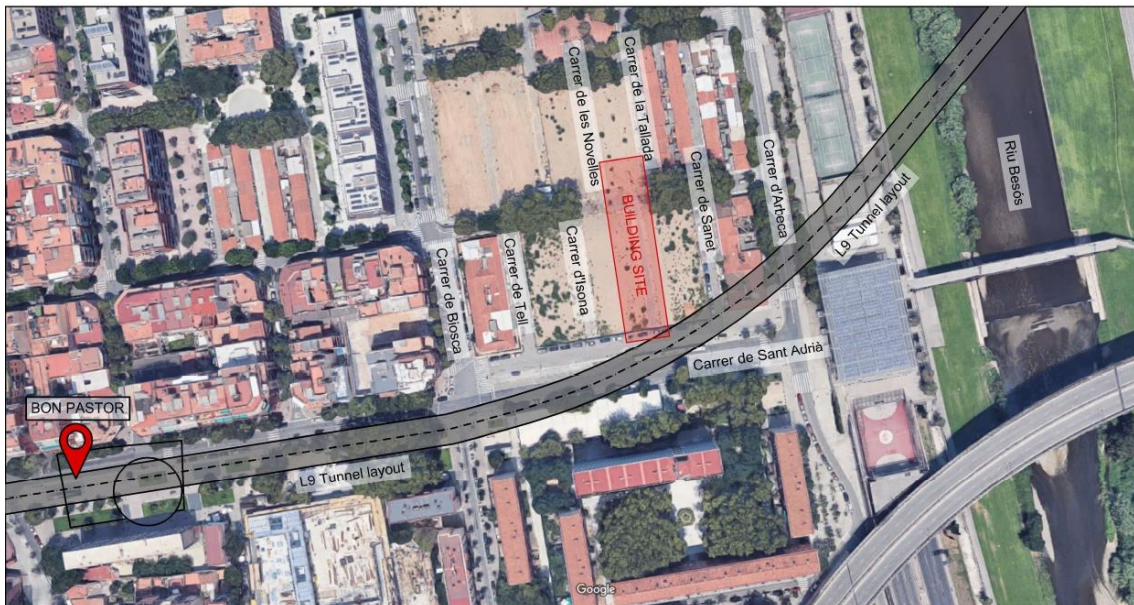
Building site location (red), TMB L9 layout and access station Bon Pastor (own development with base image from [64]).
